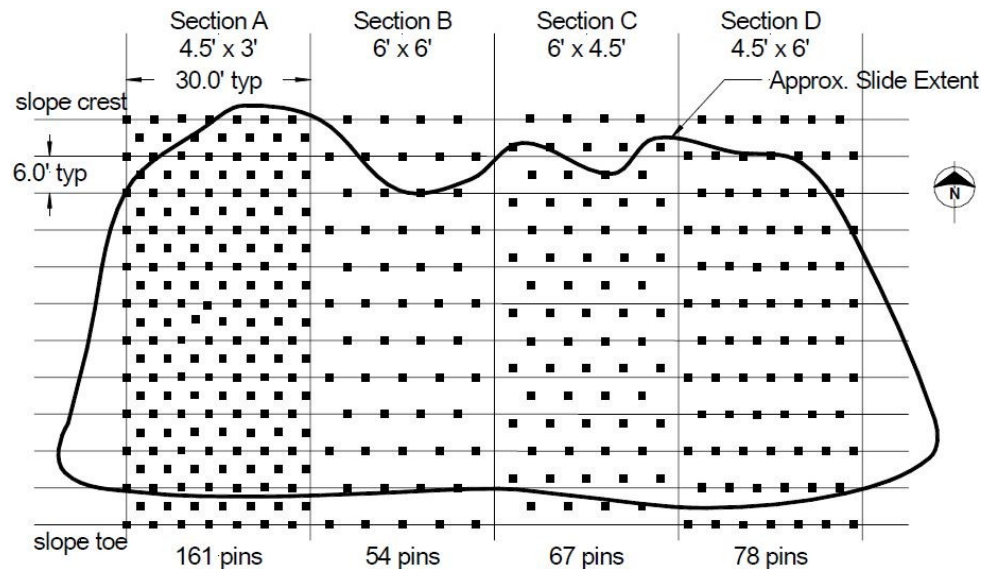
Plan Views of stabilized sections of US36 Highway (Loehr and Borders, 2007)..
